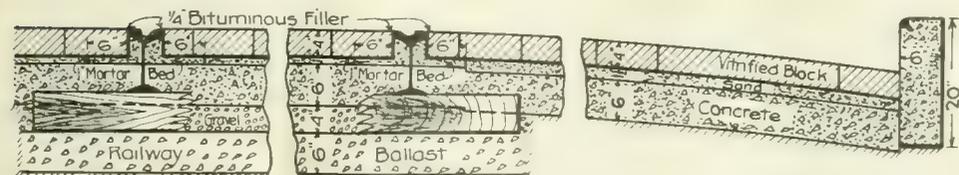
Part Cross Sections of Pavements Constructed by the Baltimore Paving Commissioners.
